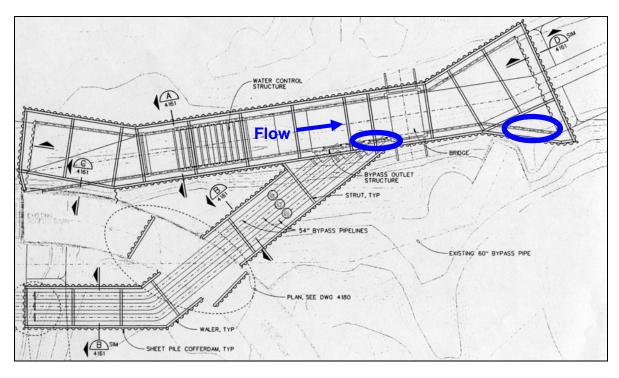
Plan view of the GCID flow-control weir (water control structure) and internal fish screen bypass outfall showing locations where striped bass and Sacramento pikeminnow have been observed with an underwater camera (ovals).
